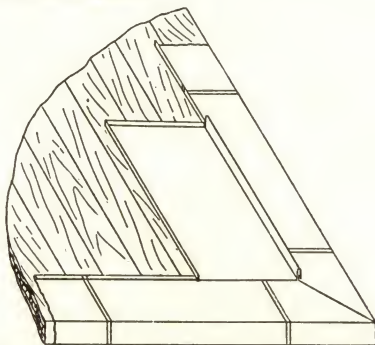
B. First Sheet in Position Showing Lower Horizontal Seam Finished
